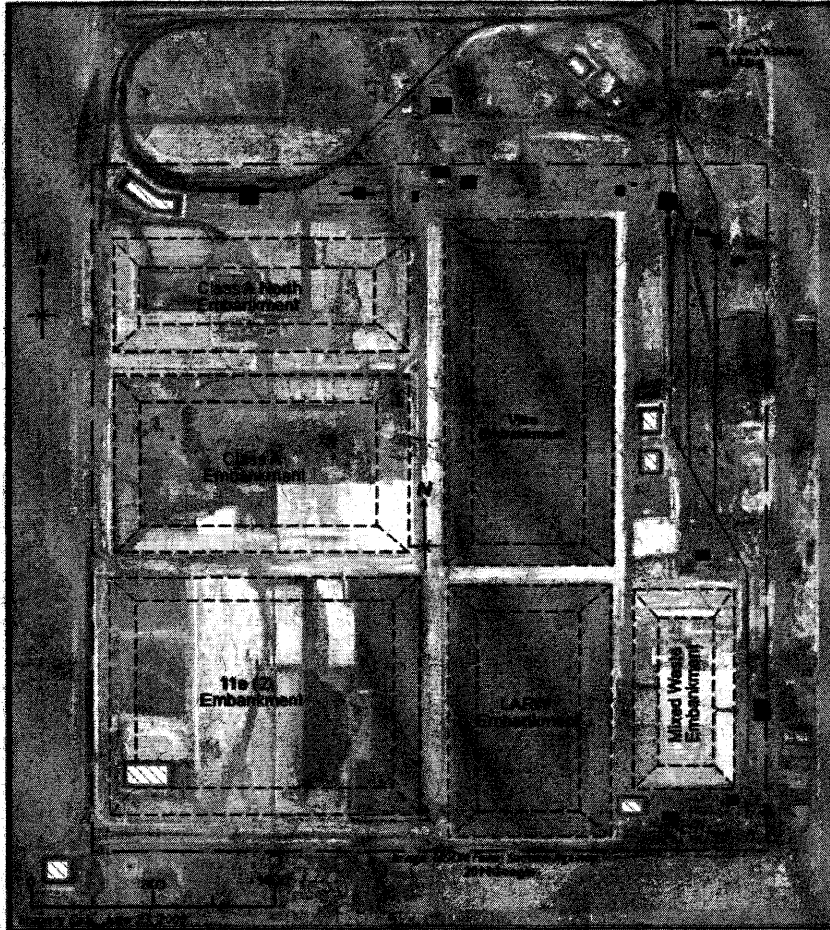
Layout of the Clive facility embankments, with the MW embankment in the southeastern part of the facility.
